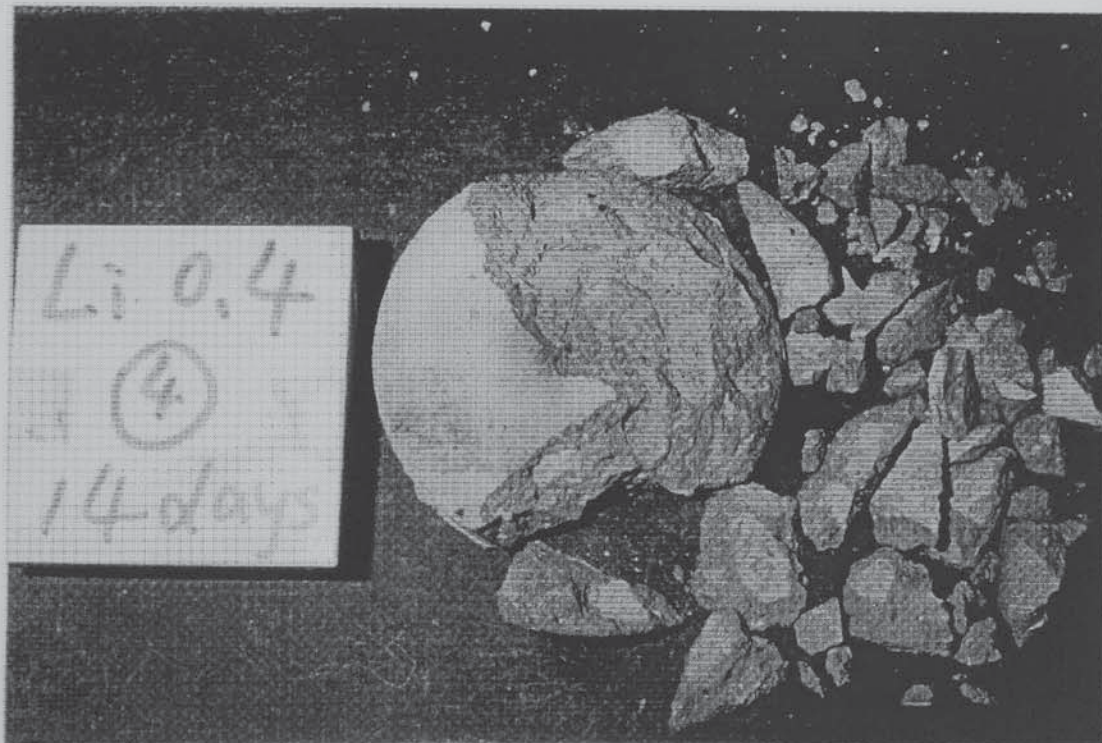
Example of Category II failure of Lytag concrete specimen
